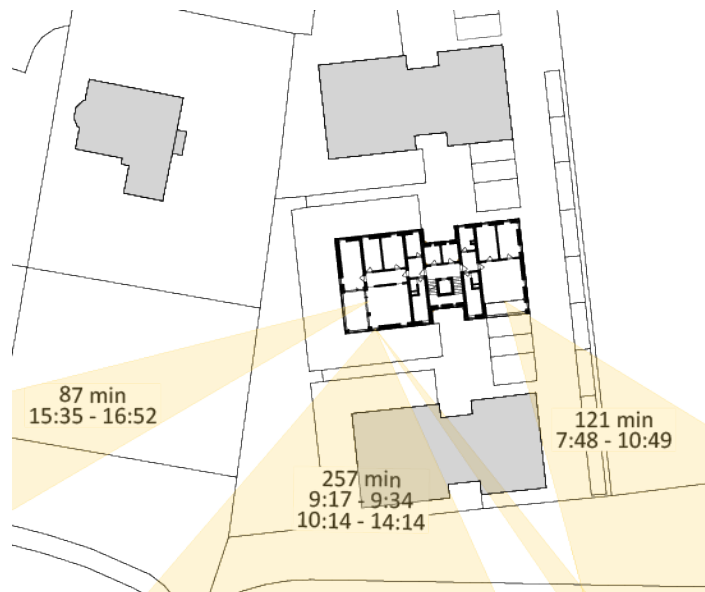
Villa Houses Krásnopolská sunlight duration on 1.3. on 2nd floor (1:1000) (source: author)
